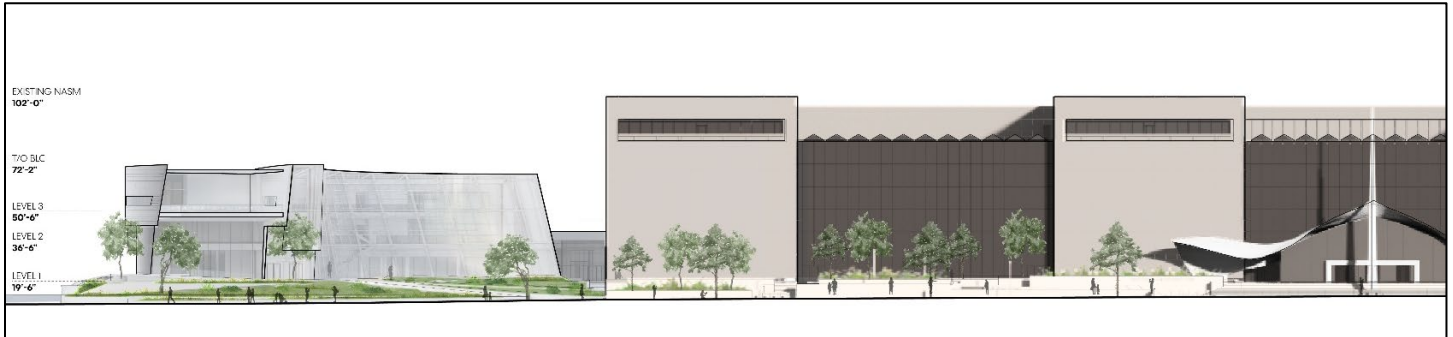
Proposed north section of the building. (Perkins&Will, 2024)
